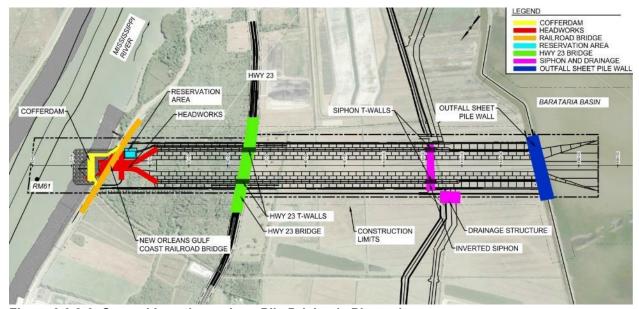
General Locations where Pile Driving is Planned
